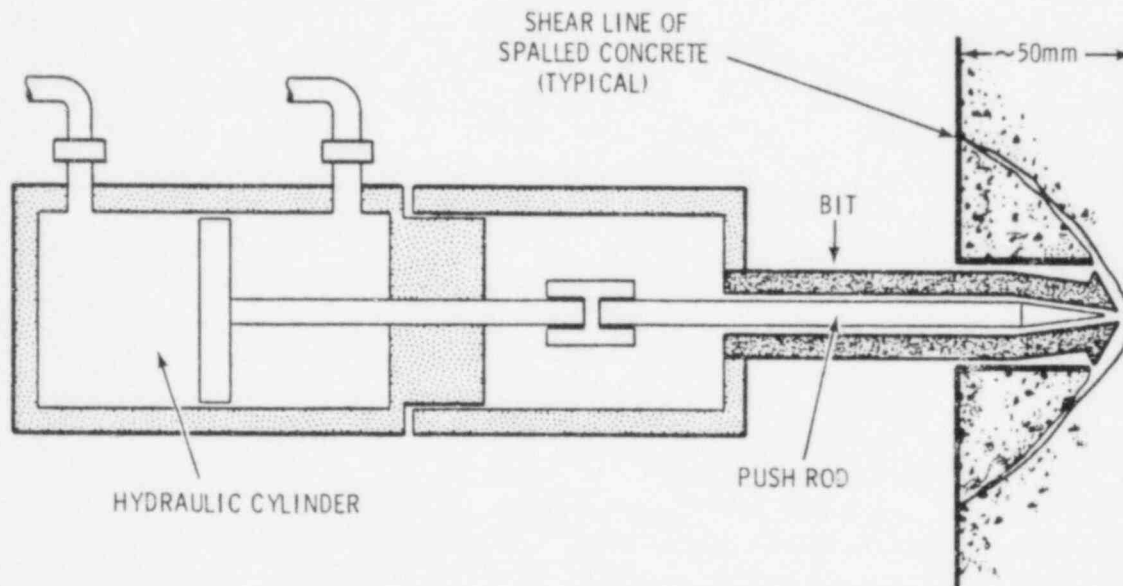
Schematic of Concrete Spaller
